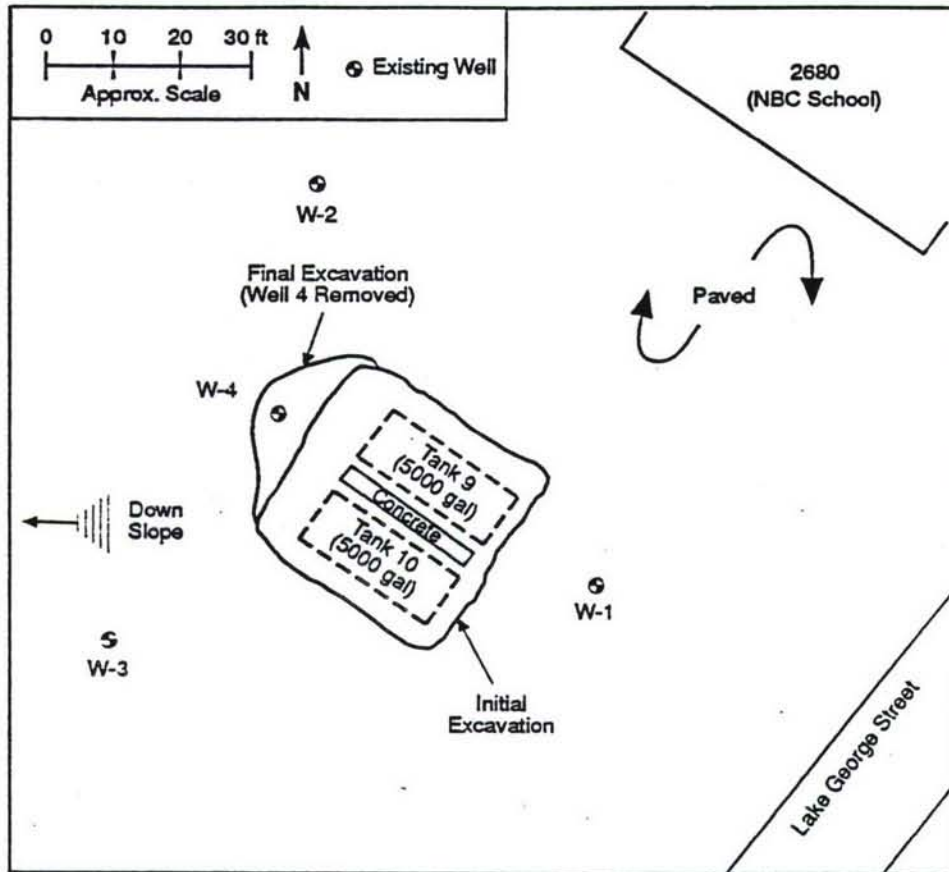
Excavation and Well Placement at SA 43-0 (SA 54) (Source: Adapted from Prior 1991)
